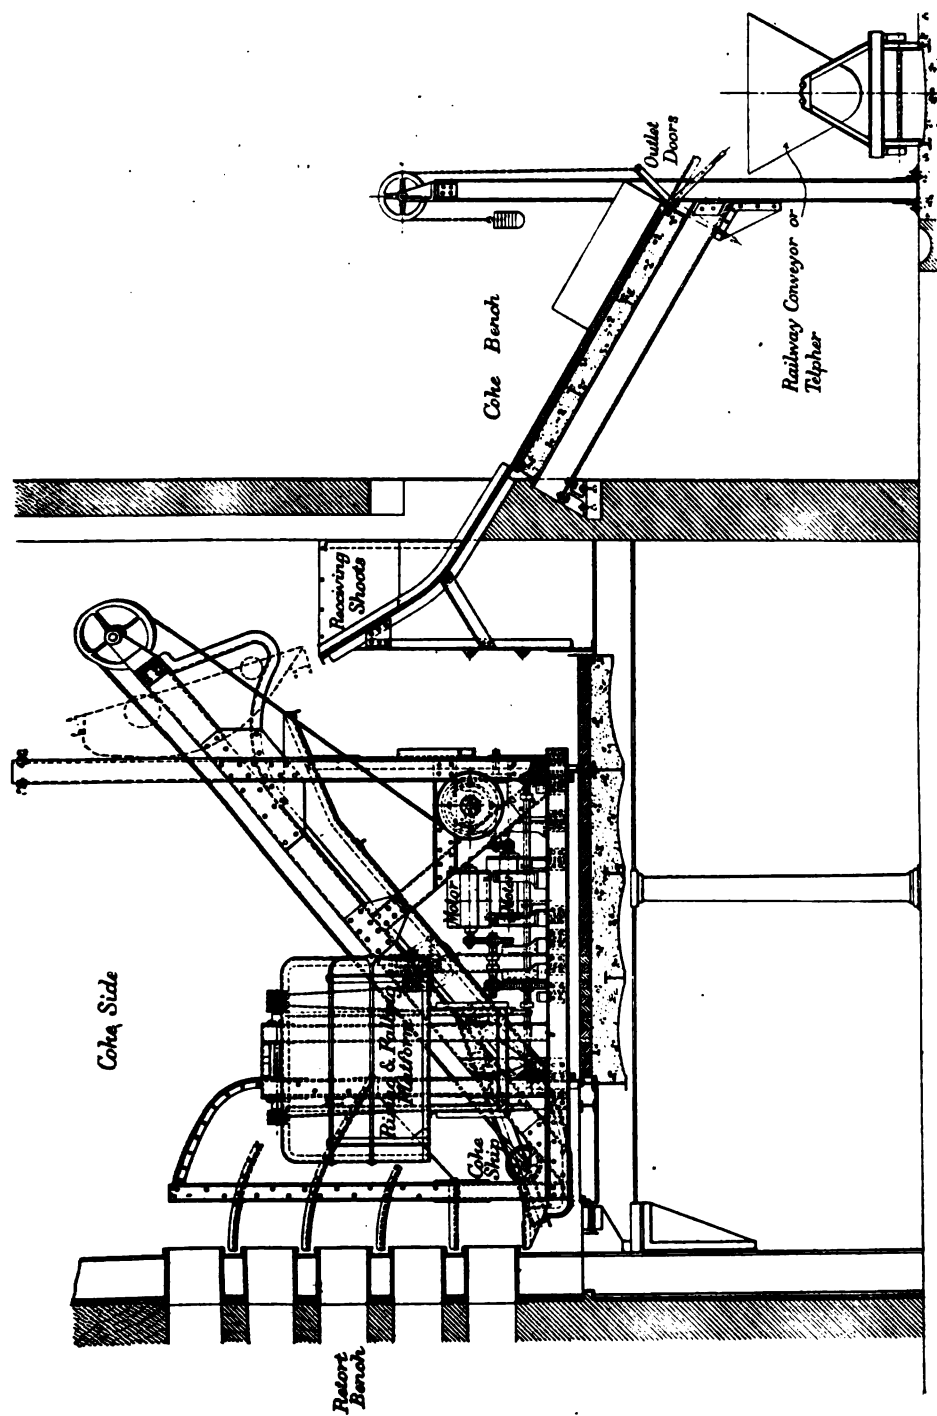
Cross Section through Retort House and Coke Bench, showing the "Ideal" Coke Handling Machine.
